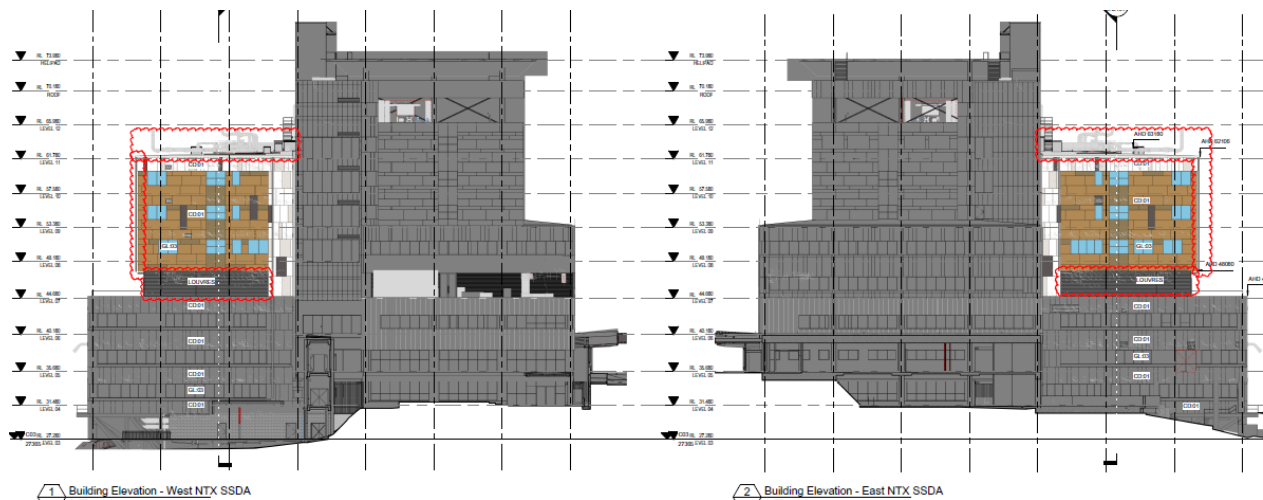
Proposed Eastern and Western Elevation Plans (Source: CGA)
